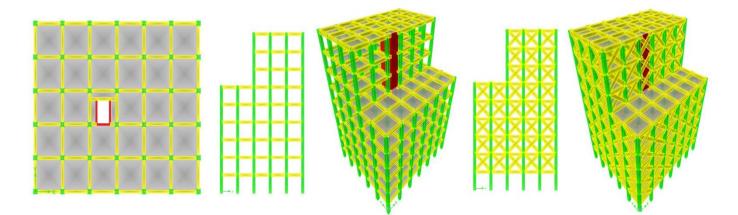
Plan, Elevation and 3D view of bare and infill frame for model-5 and model-6 respectively.
